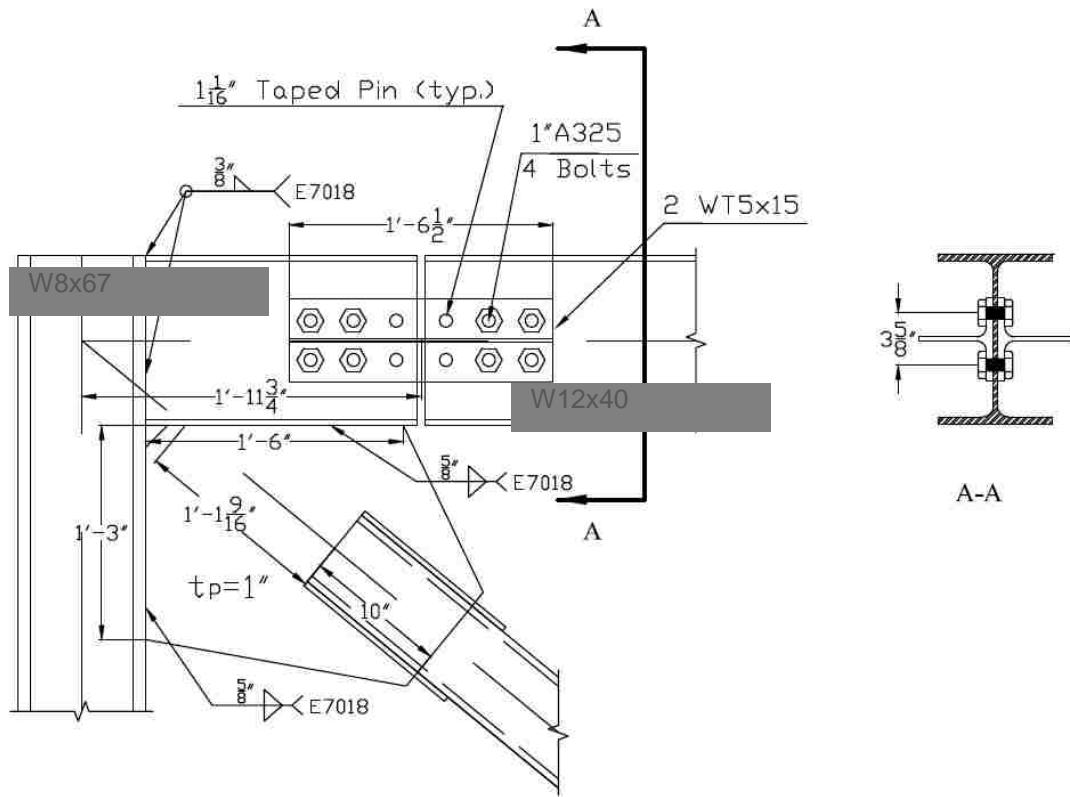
Roof Level DBF Beam-to-Column and T-Section Connection Details
